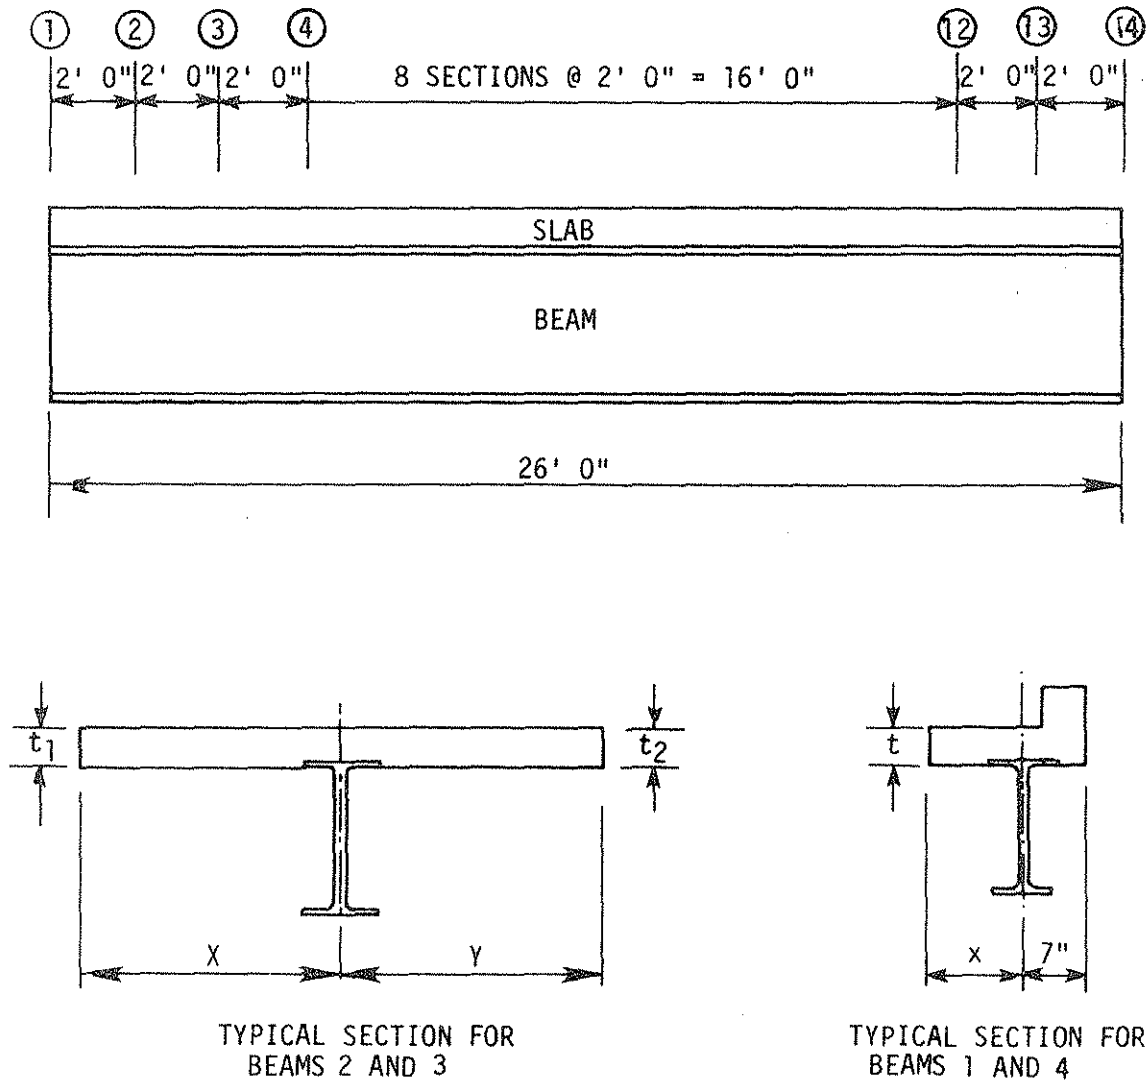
Cross-section of model bridge showing the location of longitudinal cuts.
